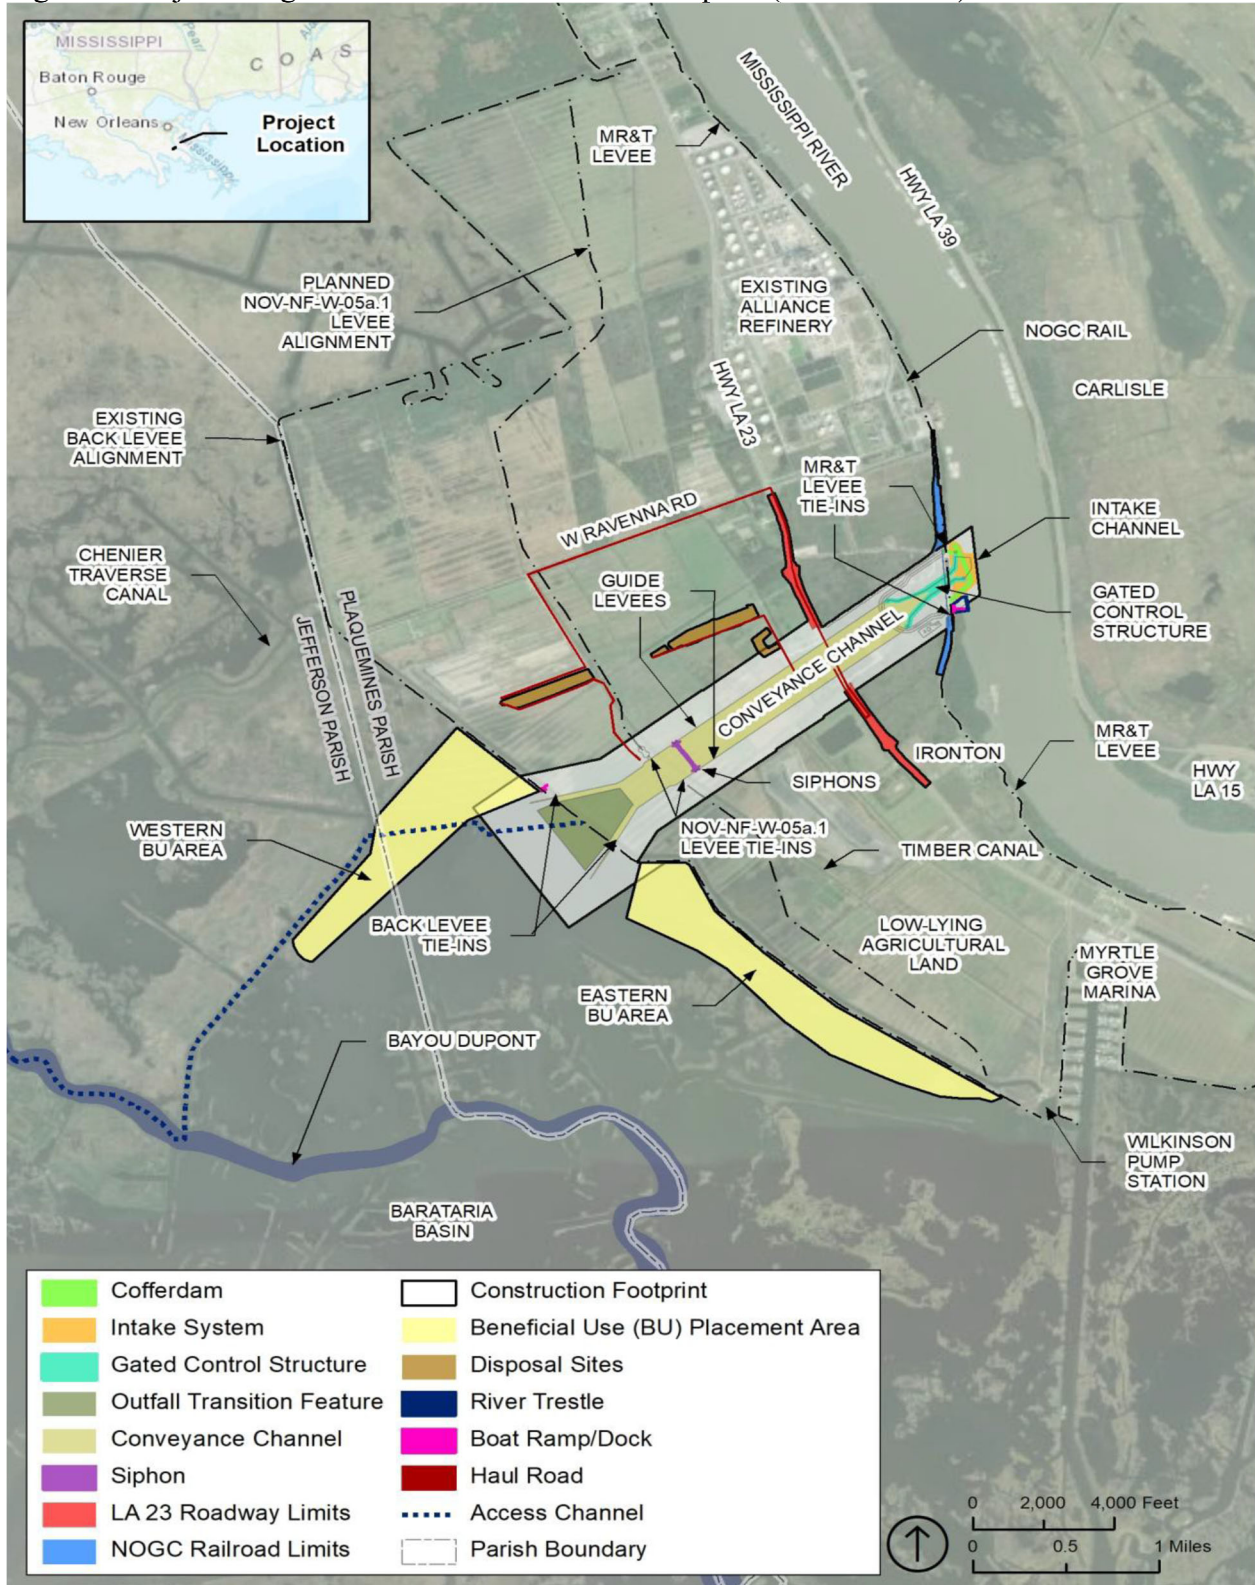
Proposed trestle and construction cofferdam overview. (LA TIG 2021)
